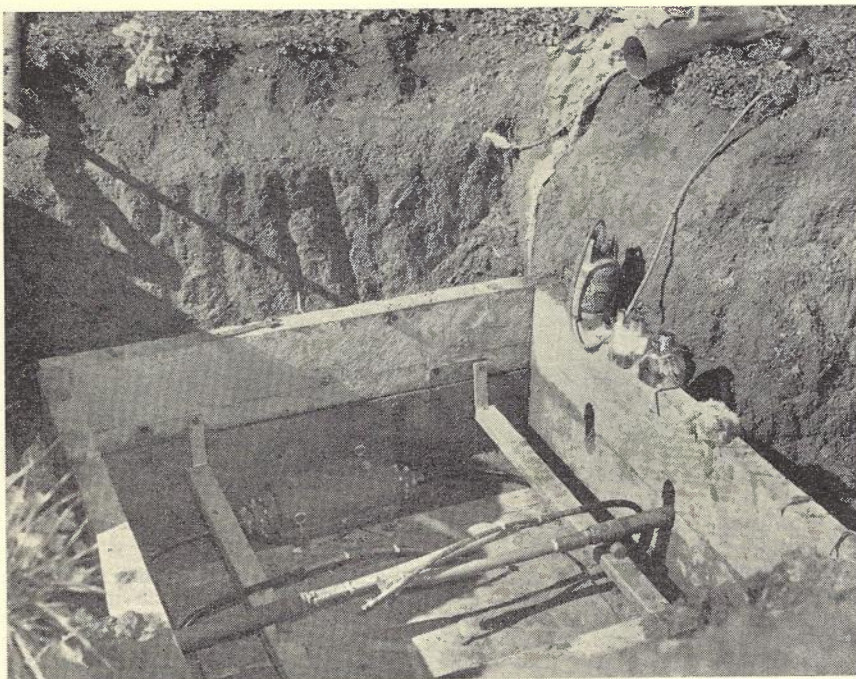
Concrete Slab Joint Box Used Between Sydney and Albury.
